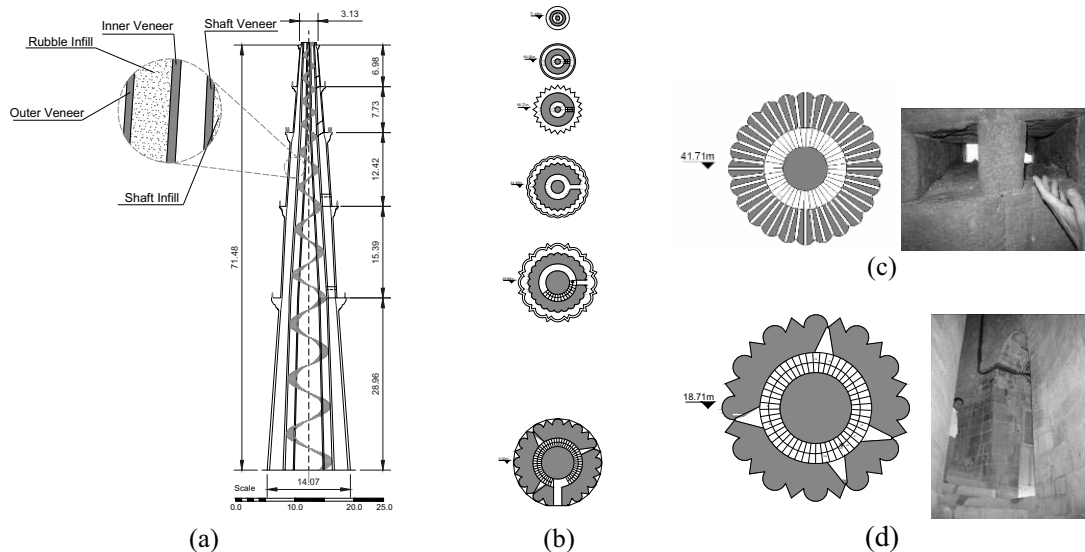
Geometrical survey: (a) vertical section of the Qutb Minar; (b) cross sections at different levels; (c) small size ventilation openings; (d) tapered windows.
